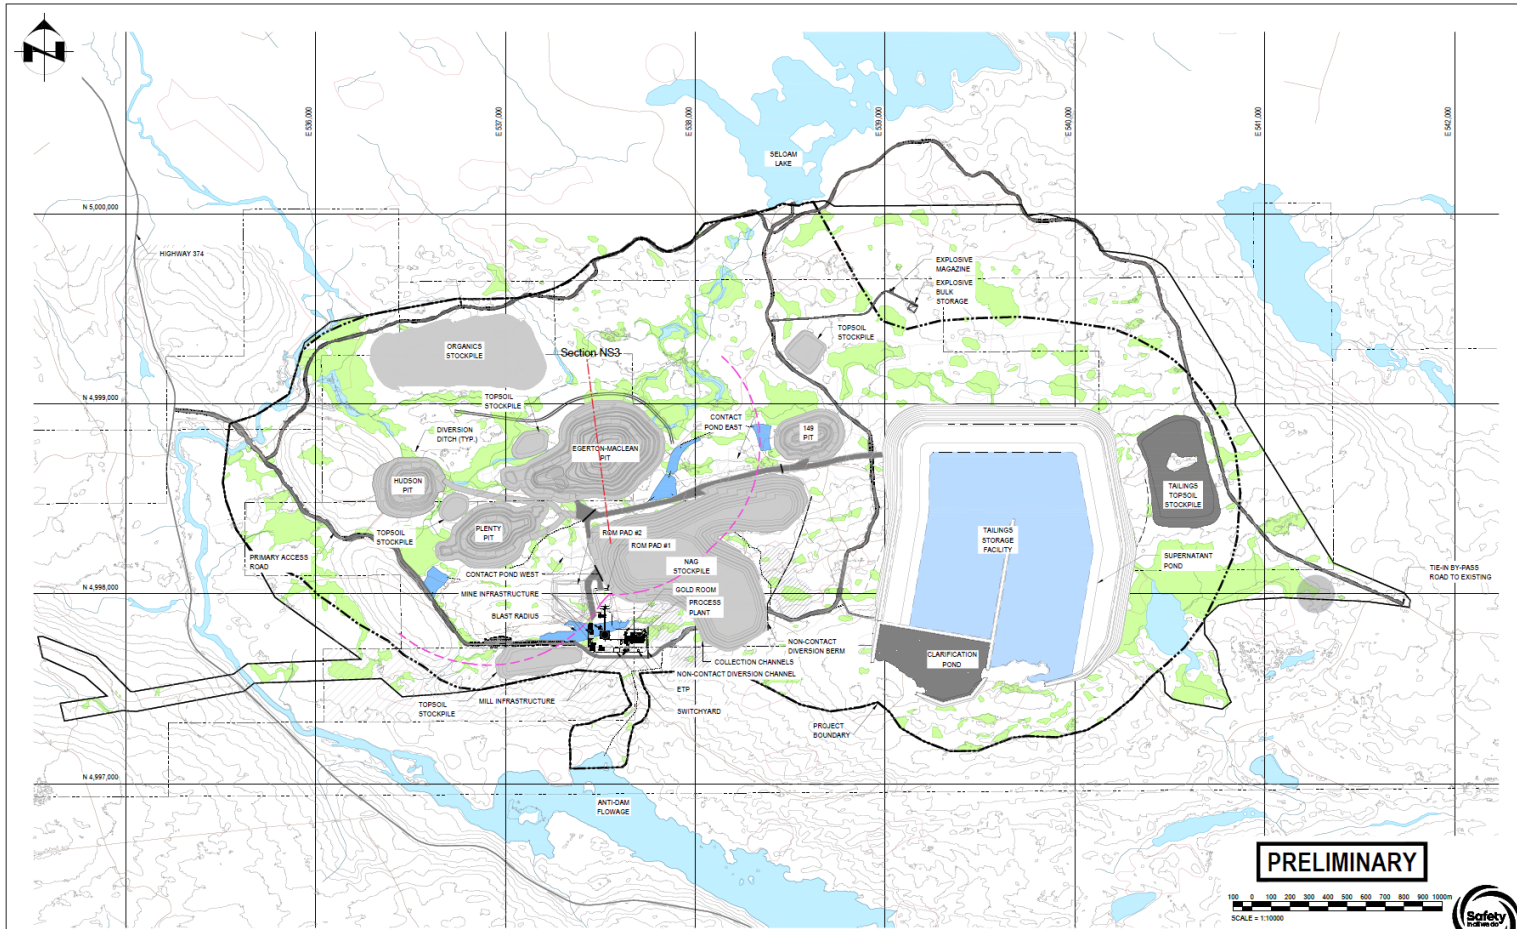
Overall Proposed 15 Mile Site Layout (note location of cross-section NS3 through the Egerton-MacLean Pit shown in Figure 5)
